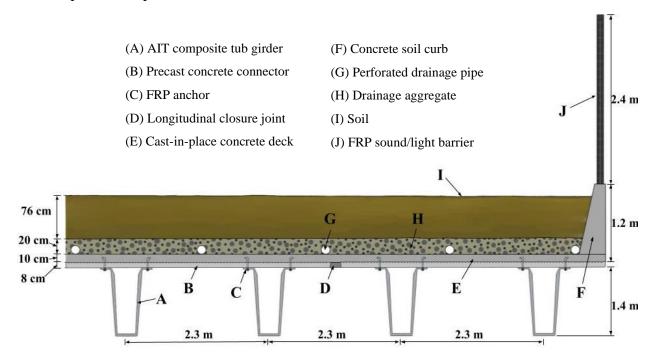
Cross section of the wildlife overpass showing the layout of the girders, concrete deck, soil, drainage, and barriers on the bridge span.
